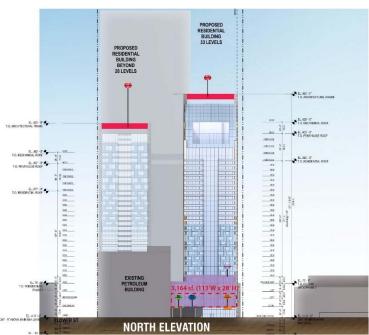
Alternative B Sign Dimensions and Locations - North Elevation
